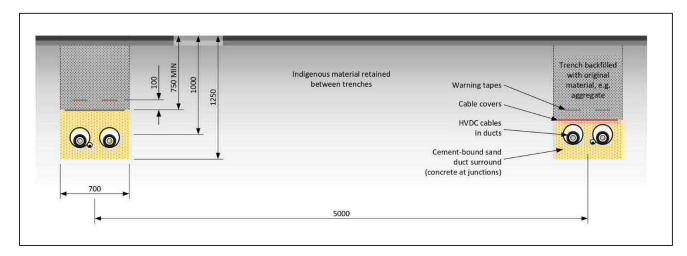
Typical Arrangement of HVDC Cable in Road, Verges and Footpath
